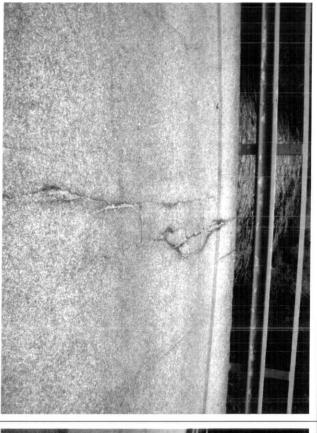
TRANSVERSE CRACKS OVER PIER.
